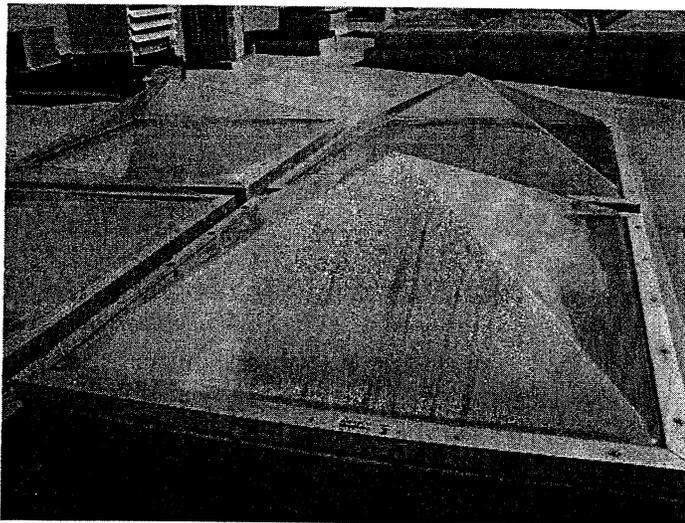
Several of the existing skylight units have damaged seals. The current placement/orientation of these skylight arrays represent significant difficulties in-regards to waterproofing/flashing details.
